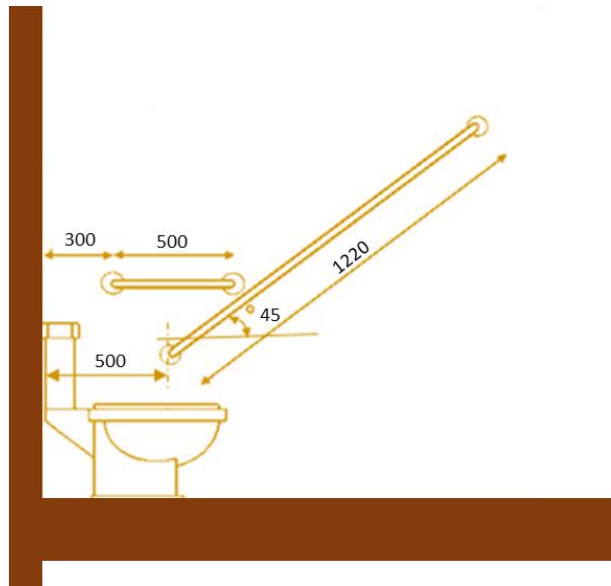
Toilet grab-bar optimal dimension (all dimensions in millimeters).
